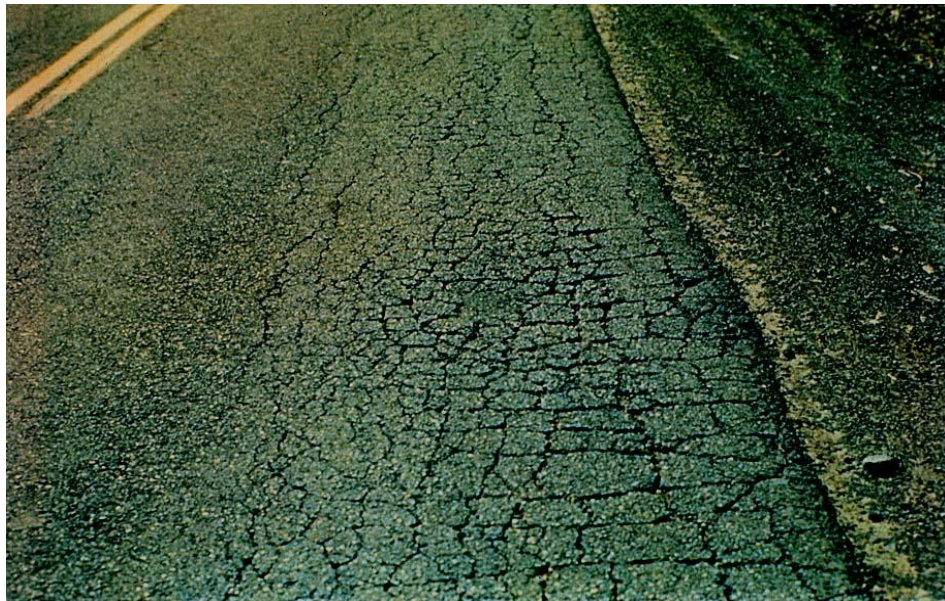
Road Pavement Crocodile Cracking
